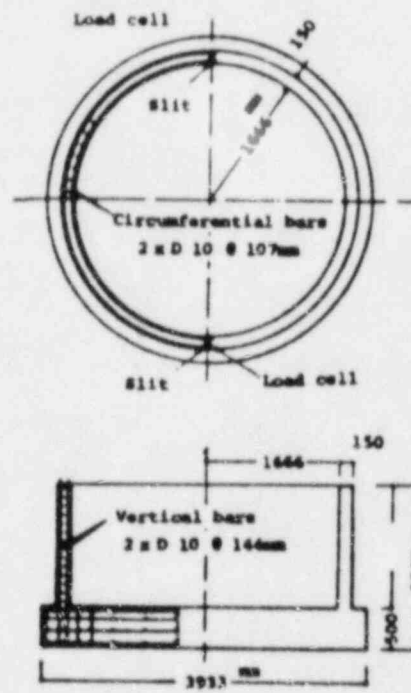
Test Model and Arrangement of Reinforcement
